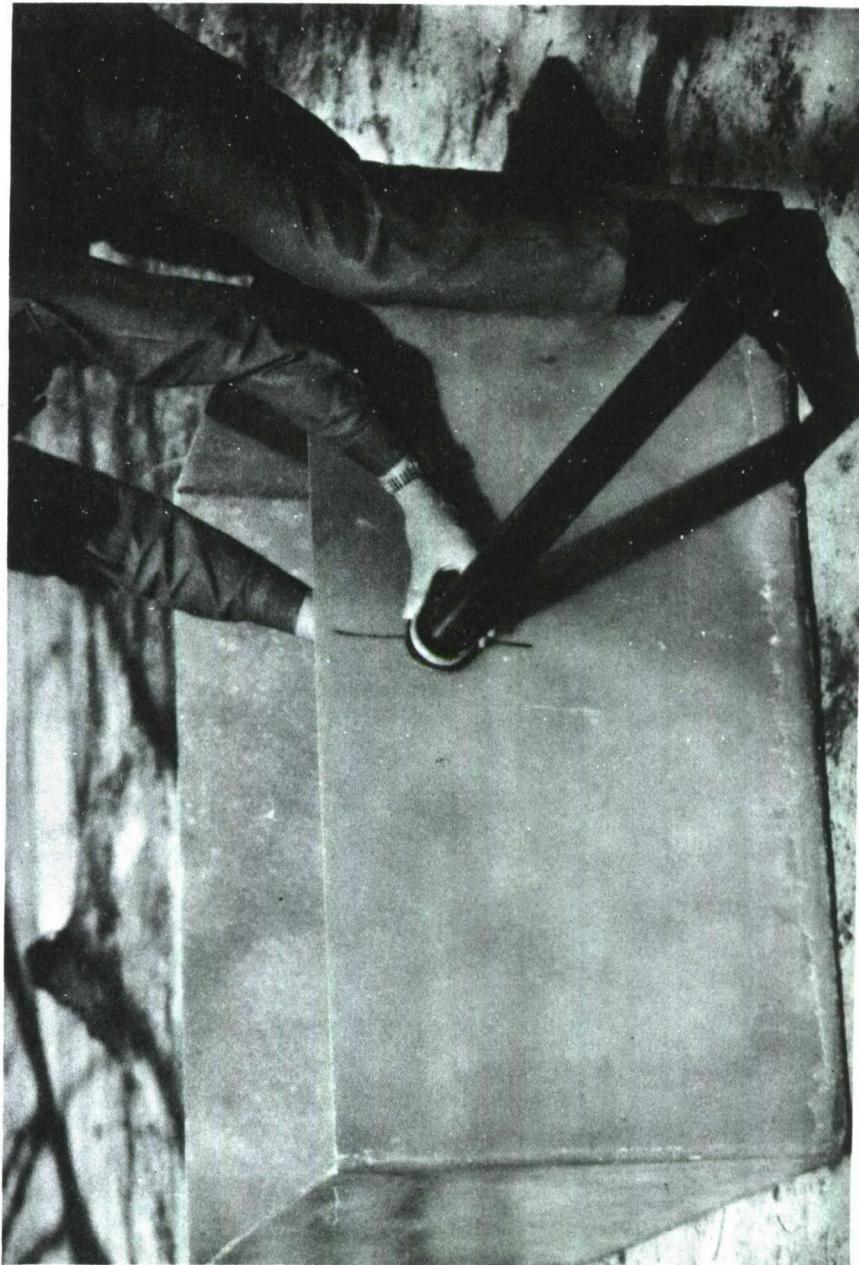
Slide gasket and nut over pipe - draw up tight - tee in tank should point up and down.
